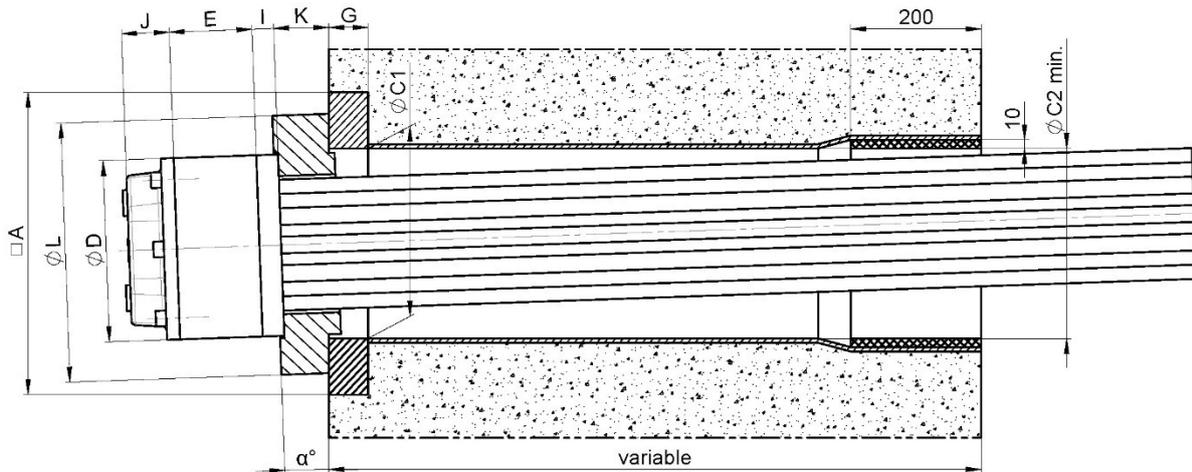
Anchorage type E-WT - Arrangement without shim plate - Dimensions
